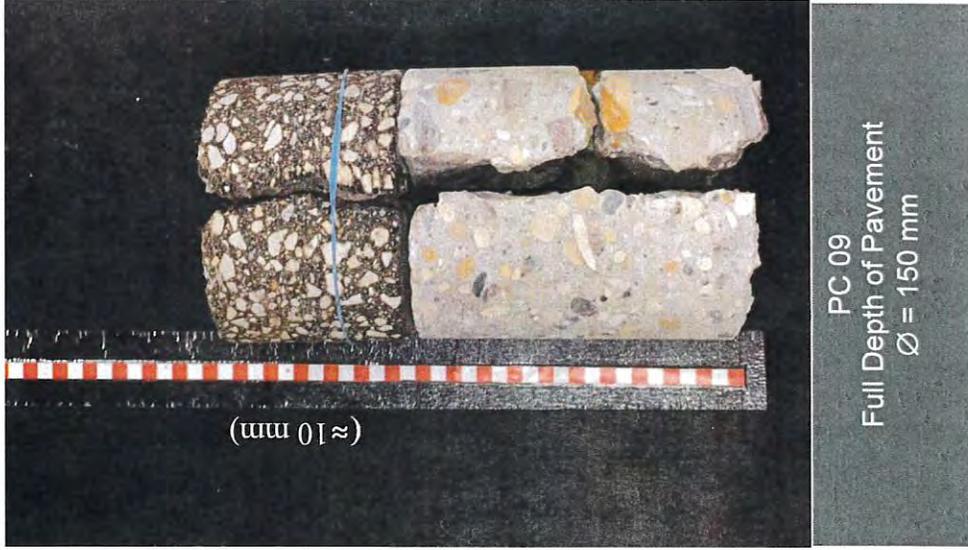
Specimen from Leila Avenue, Eastbound Curb Lane
